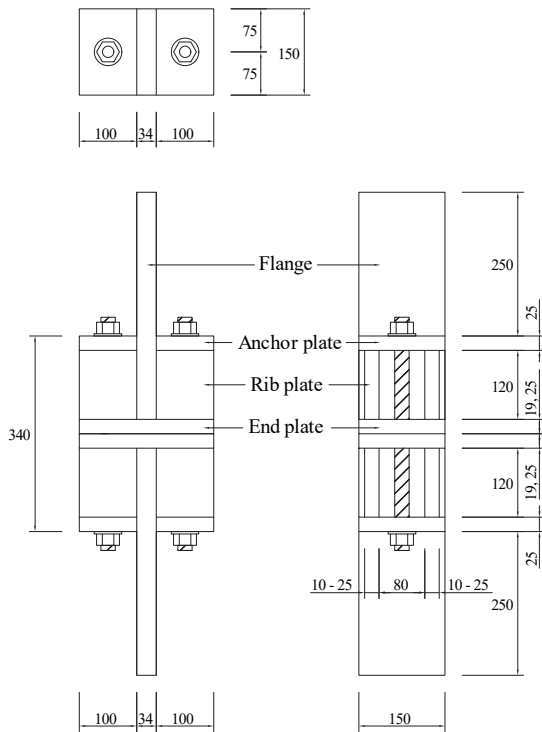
Shape and dimensions of specimen (Unit: mm)
